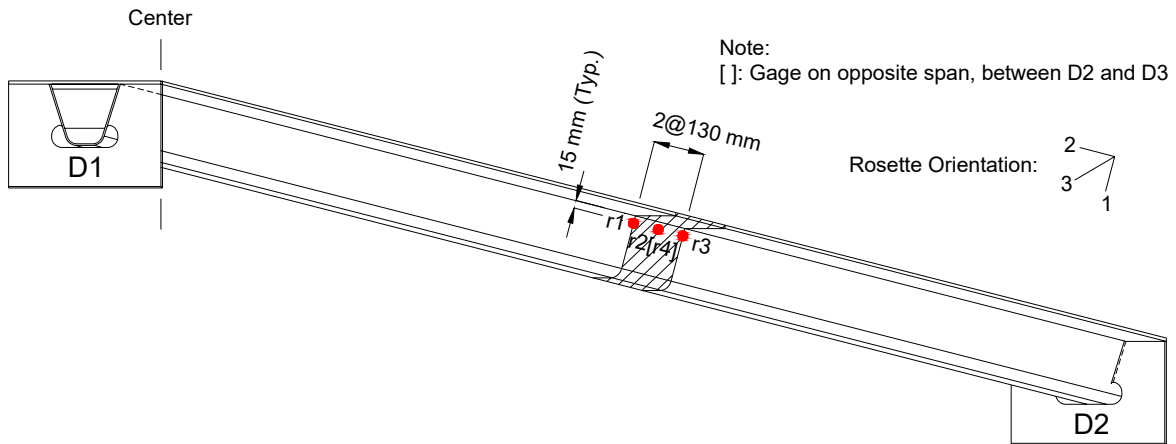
Specimen 4: Strain Gages in Outer Surface of Rib R2 near Rib-to-Deck Welds
